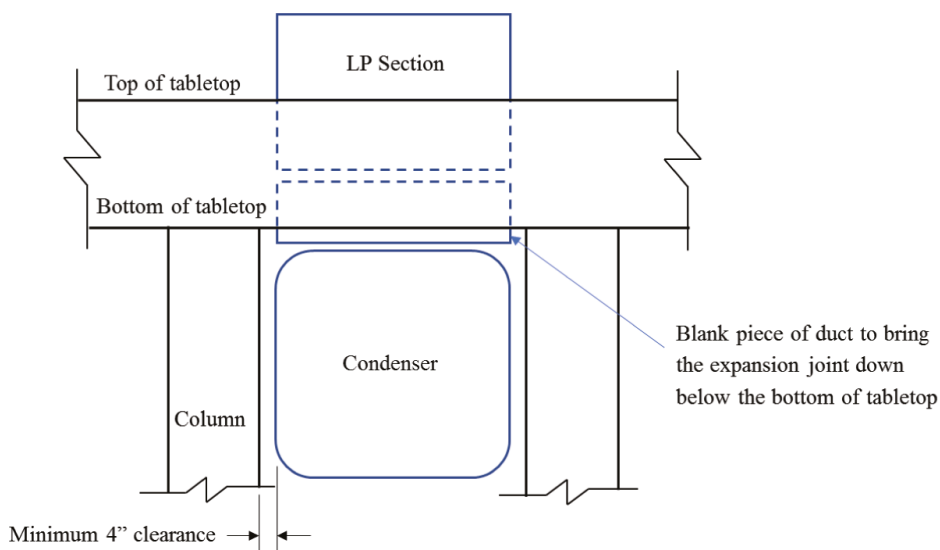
Condenser to LP turbine interface, and minimum space between condenser and columns
